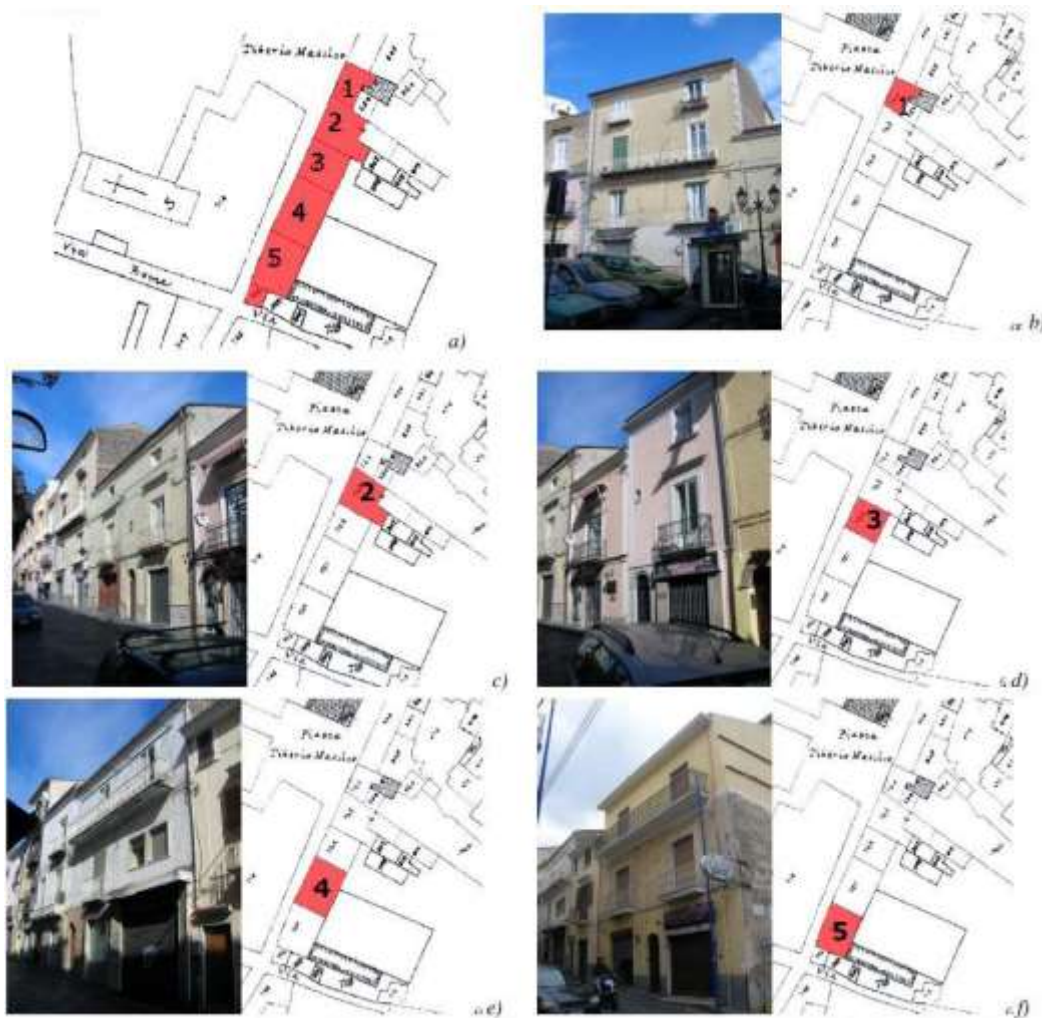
Aggregate effect: a) floor plan; b) building no. 1; c) building no. 2; d) building no. 3; e) building no. 4; f) building no. 5 (Formisano et al. 2011).
